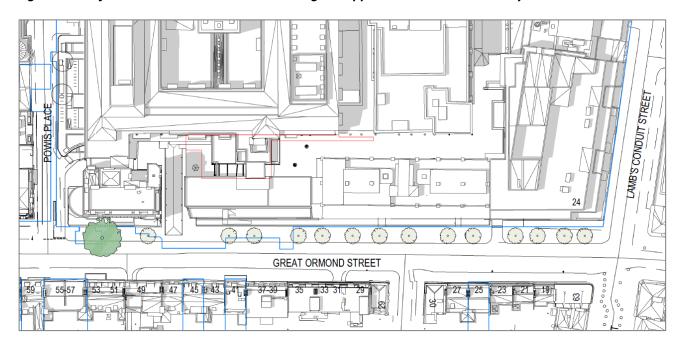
Extract from the Site Location Plan showing the application red line boundary
